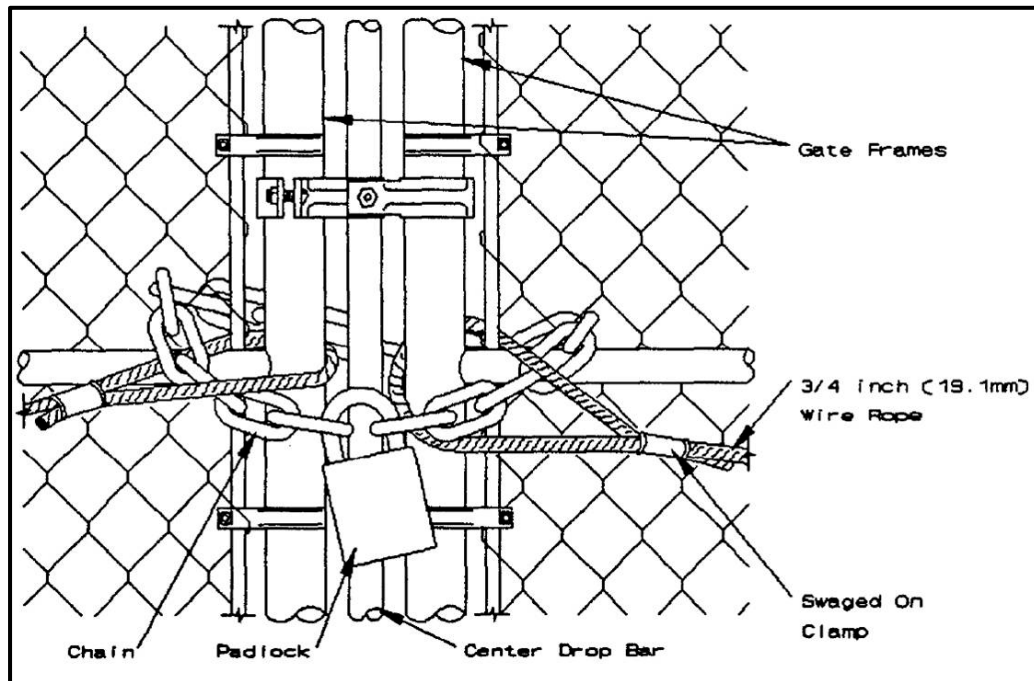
Locking Assembly for Reinforced Sliding Gate
